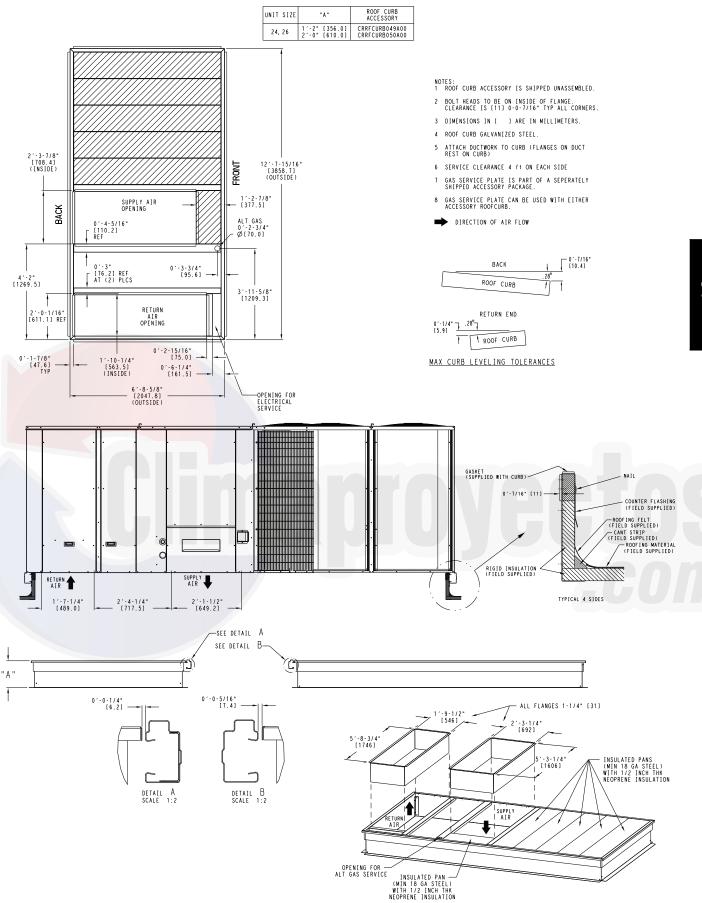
Roof Curb Details - 24 and 26 Size Units
